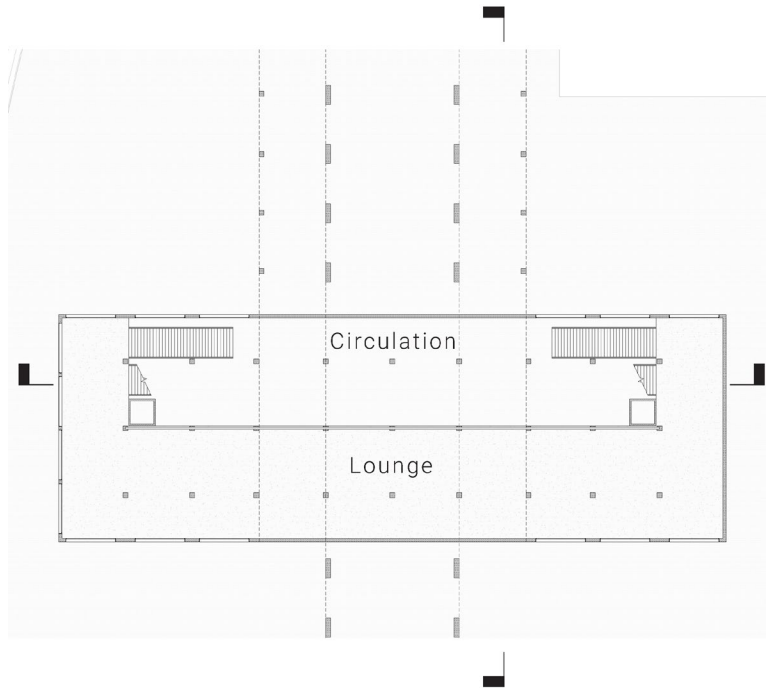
, Train Station - Enlarged Plan – Building Upper Level (Source: Drawn by Author)
